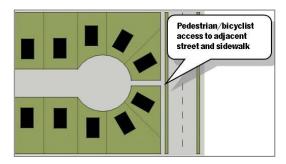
Pedestrian Access from Cul-de-Sac to closest street
